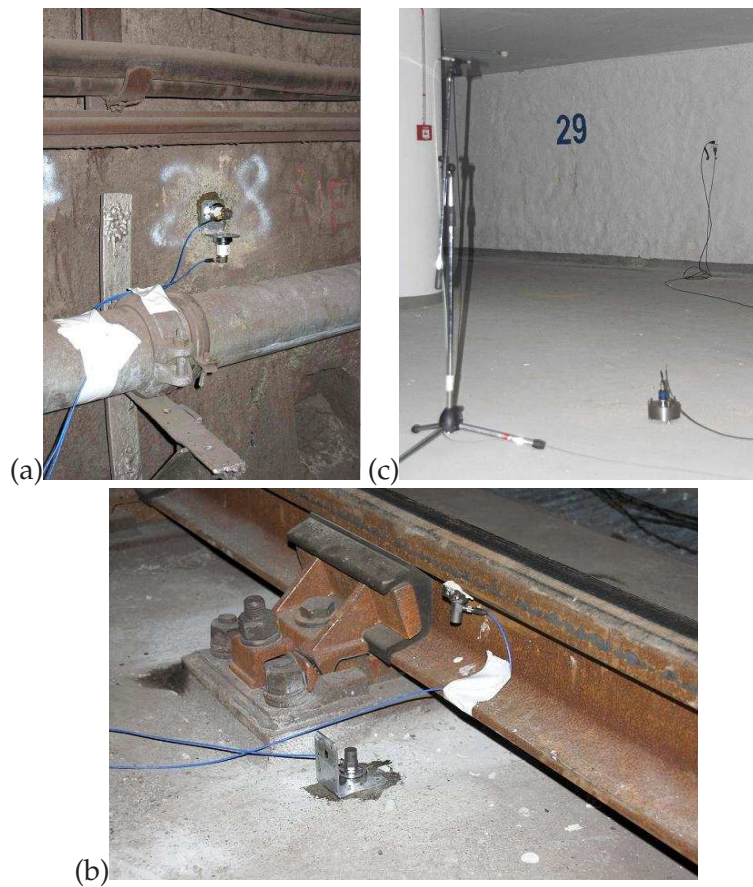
Acceleration sensors (a) at the side wall of the tunnel, (b) at the base plate of the tunnel and (c) on the floor and the wall of the basement of the Kálmán Center
